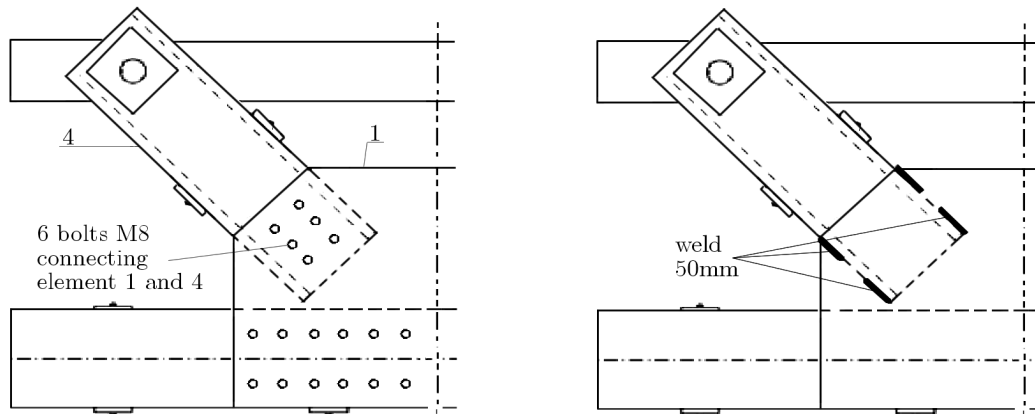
Diagram of the tested node – bolted and welded
